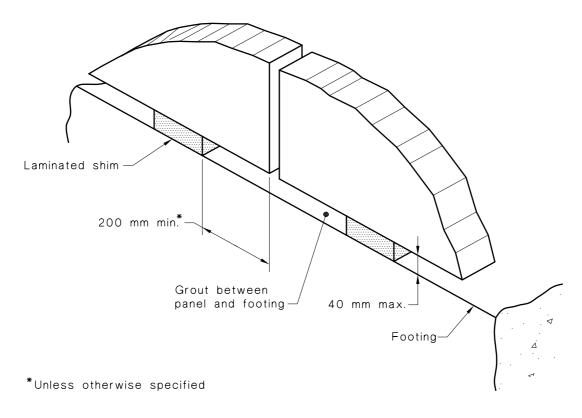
TYPICAL SHIMMING DETAIL
